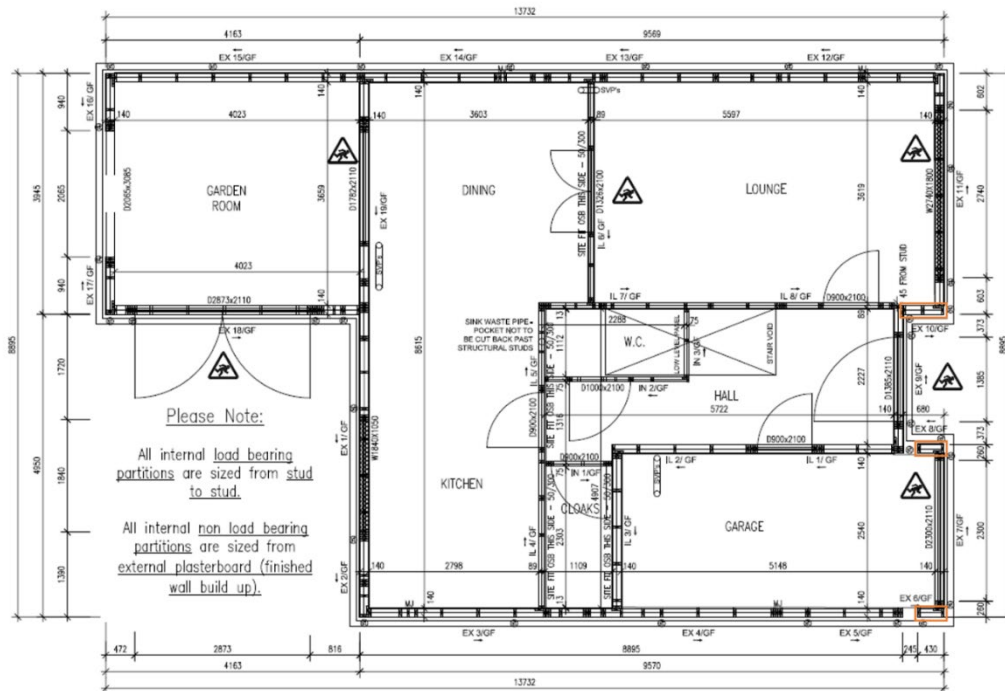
original ground floor layout. Wall panels in orange rectangles are omitted thanks to new layout.
